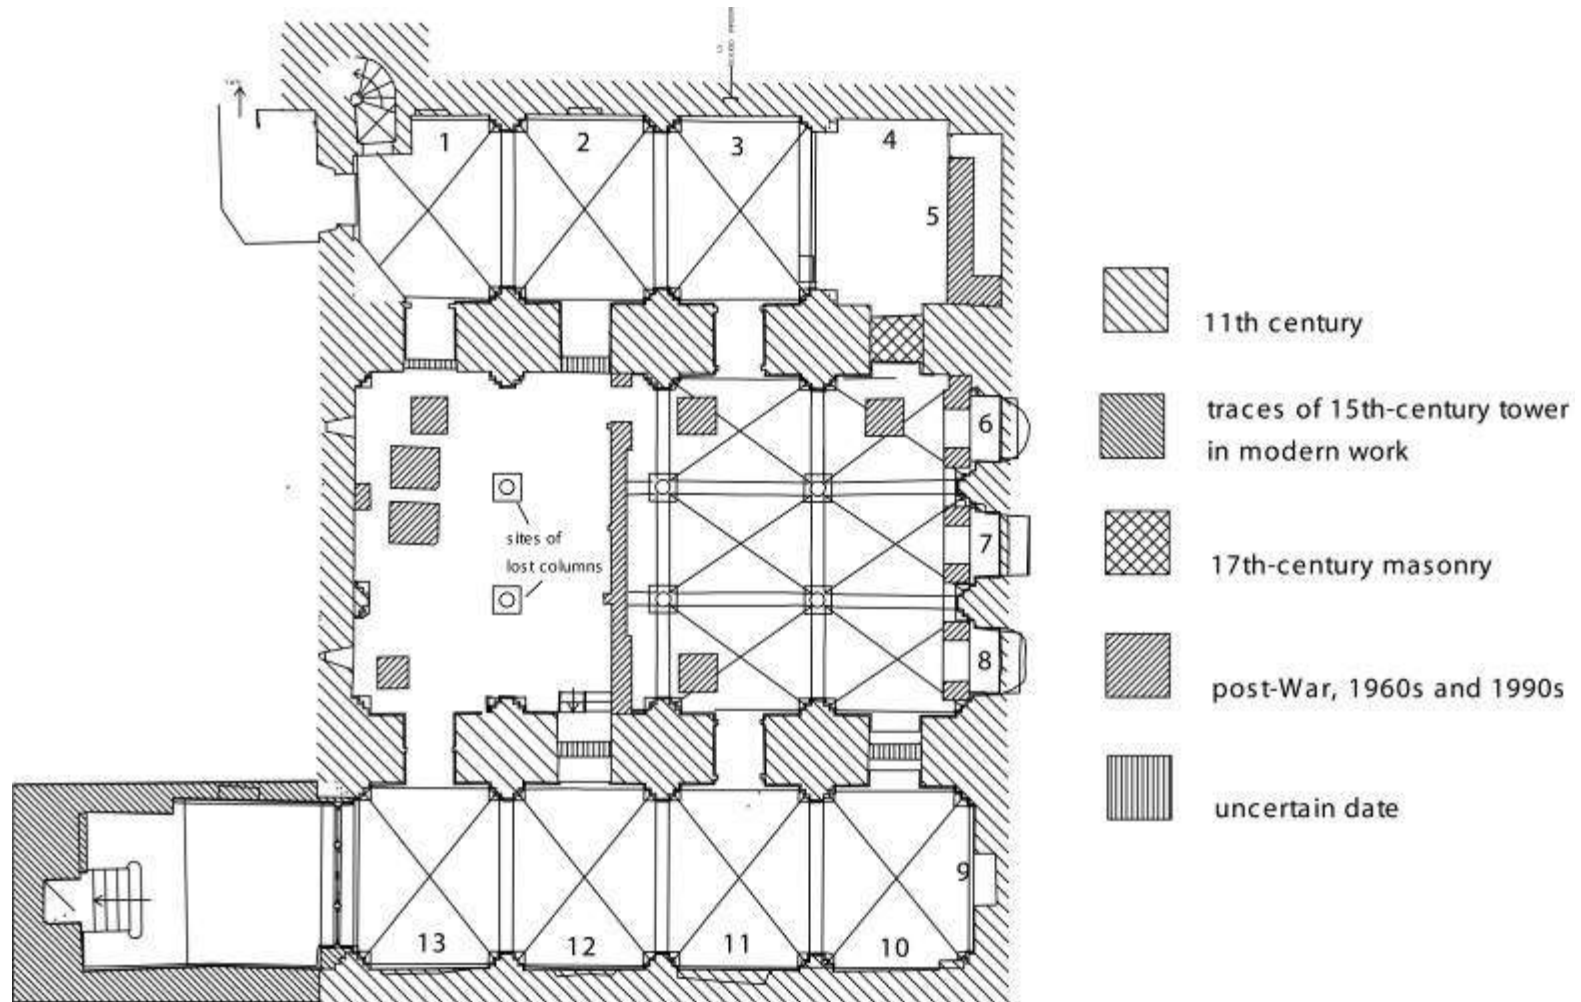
Plan of the crypt, showing the numbering of the bays of the exterior walls. North is to the top of this plan, as viewed from this direction
